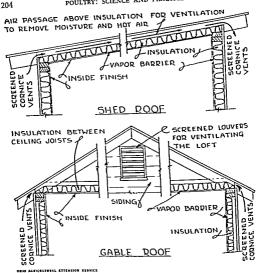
Ceiling insulation for shed and gable roof houses.
